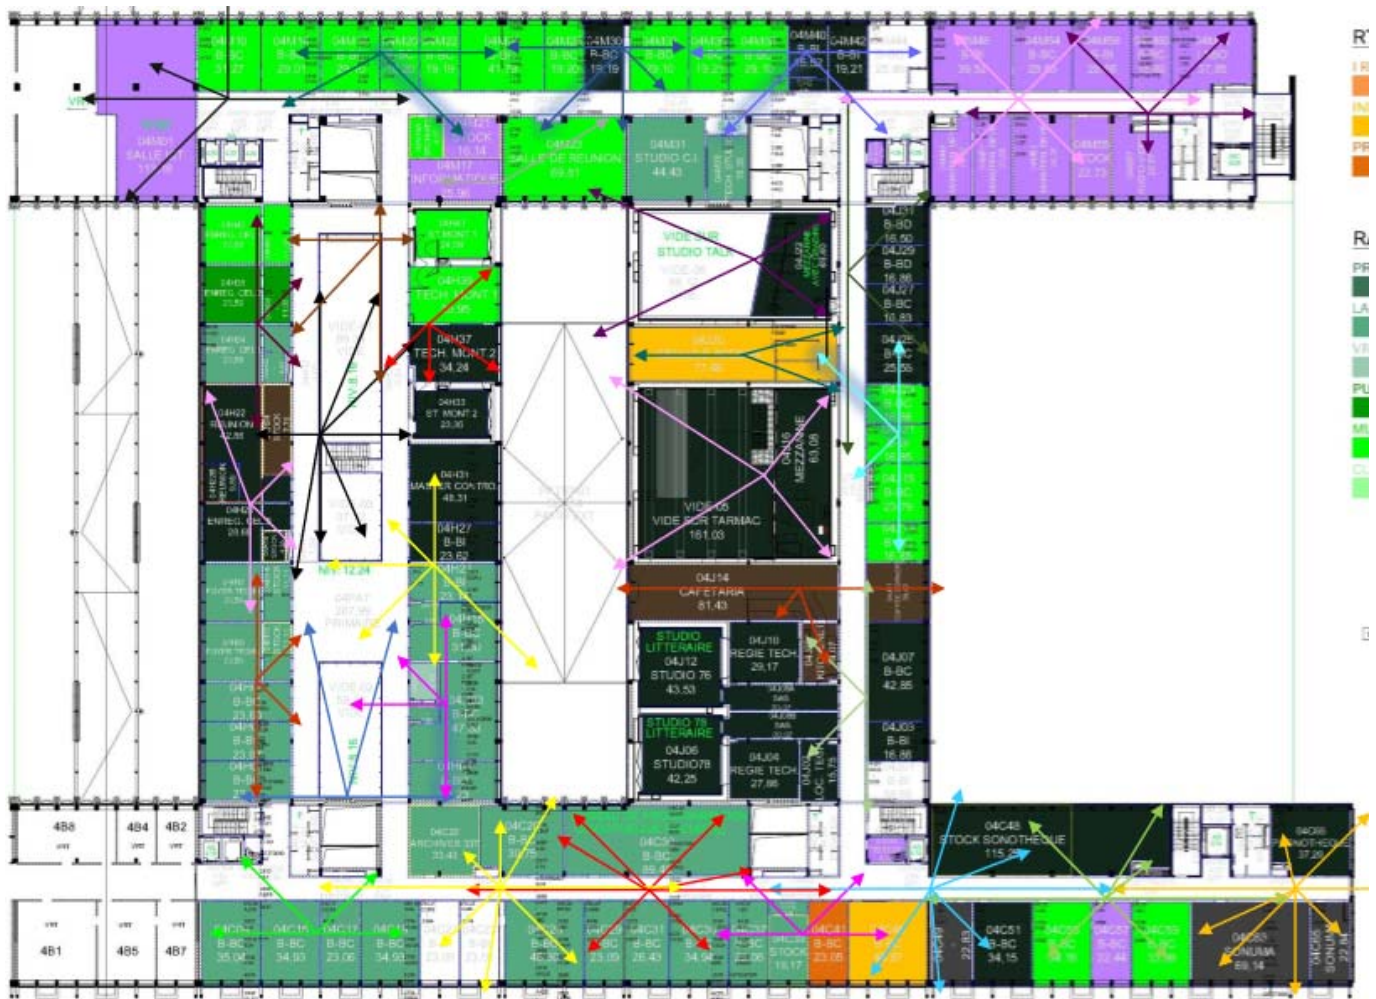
Design at 5 GHz for Floor 4 in Building PUVQ
